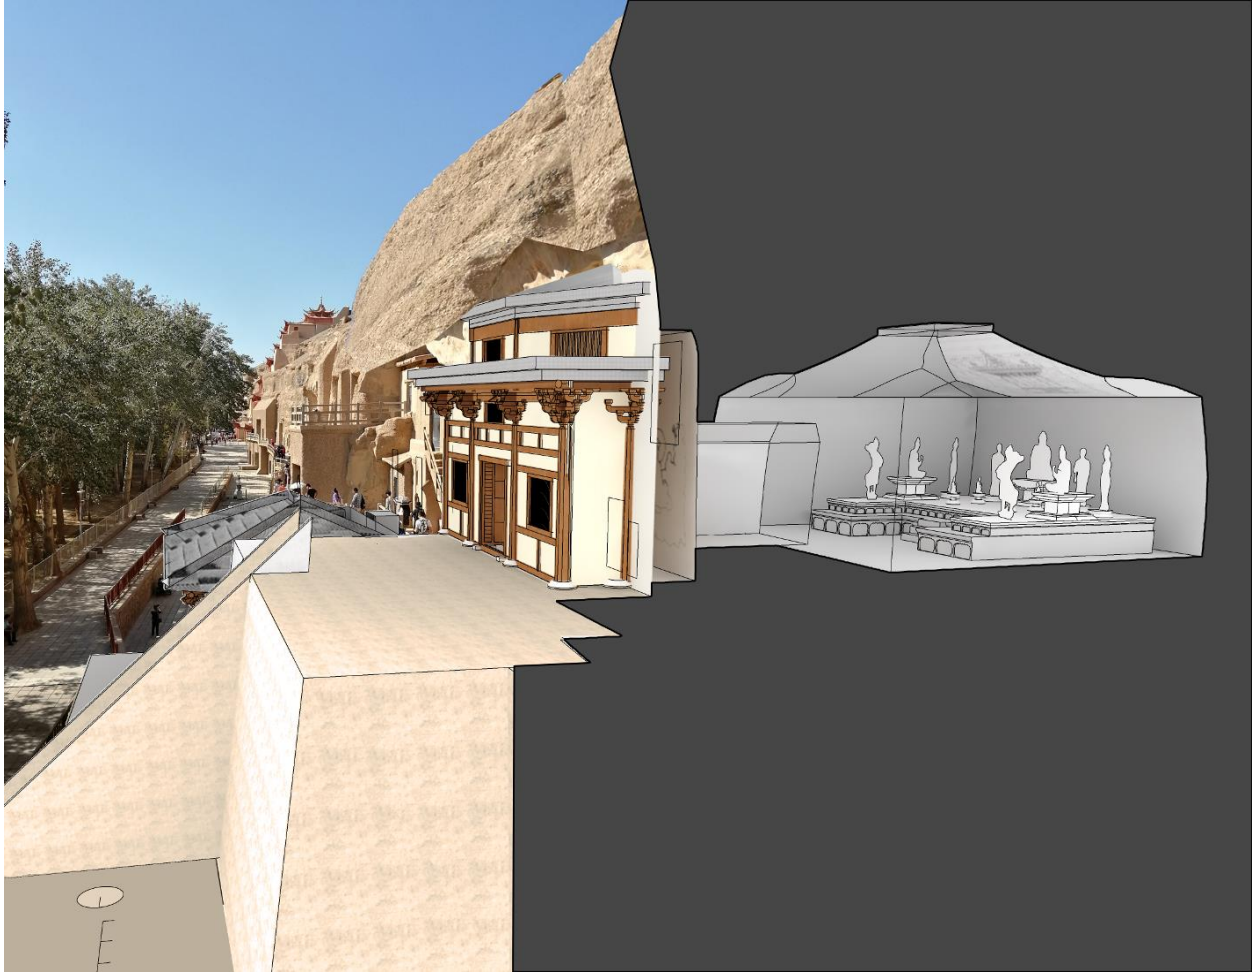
Sectional perspective of Cave 454 with façade. Drawing by author.
